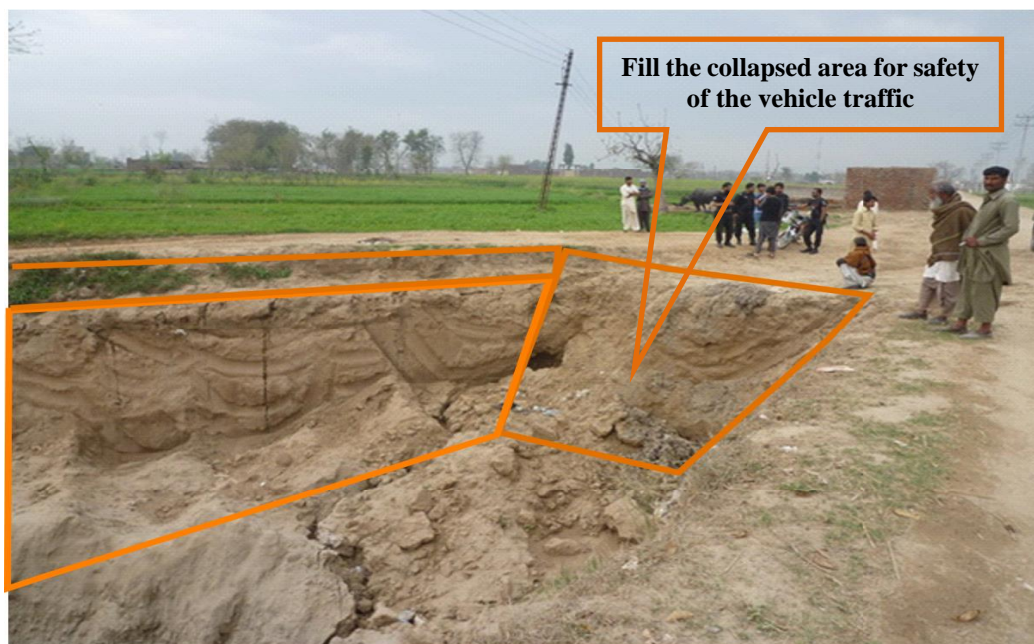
Collapse of Gondlanwala Landfill Site
